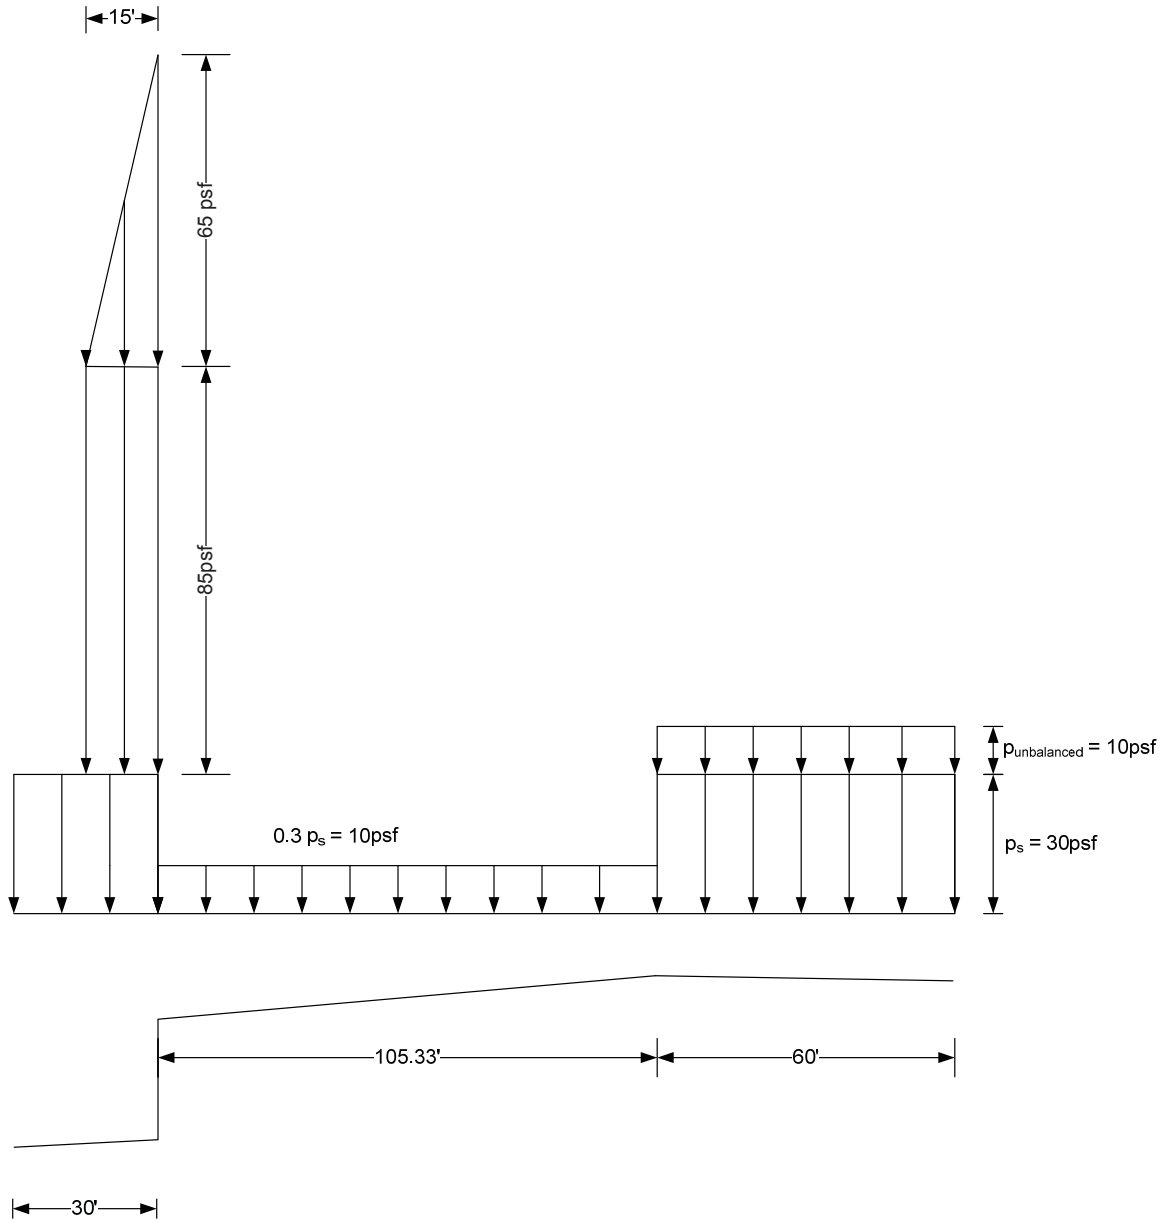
Case 2: Unbalanced Snow Load for East Direction Sloping Roof with Drift Load and Sliding Load on Lower Roof
